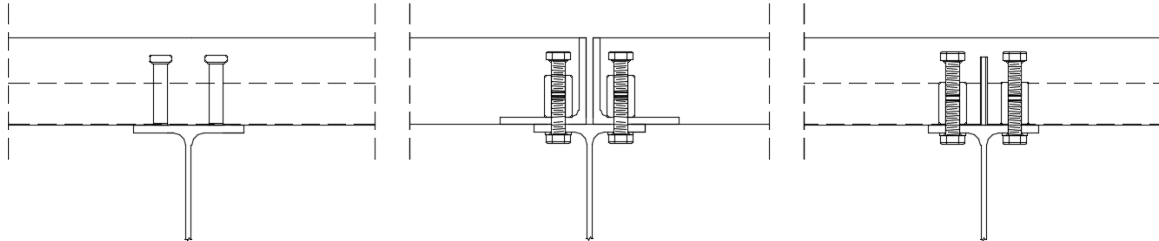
a) Traditional profiled sheeting slab, b) Demountable prefabricated solid deck, c) Demountable in-situ casted profiled sheeting slab
